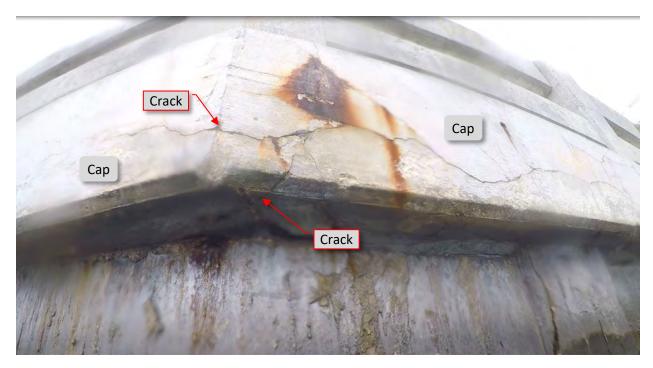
C14. STA 6+22 - 6+40. Crack at cap's vertical and bottom faces.
